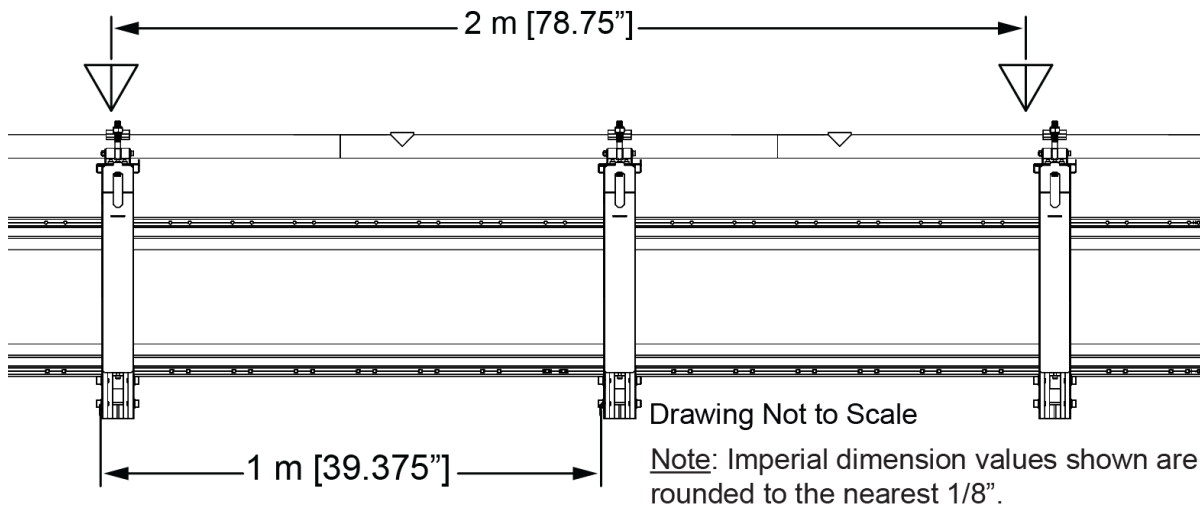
Maximum Anchor Point Spacing - Ladder Truss
